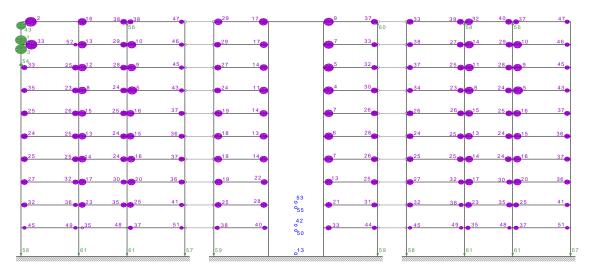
Opening of the plastic joints and required ductility, 7 stories-60x60cm columns
